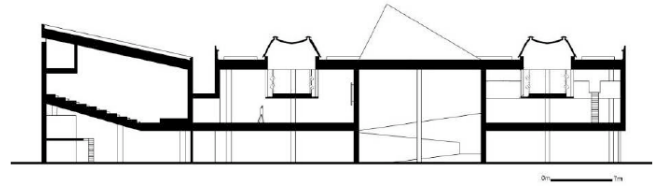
A section of lighting, Tokyo Museum of Western Art.
